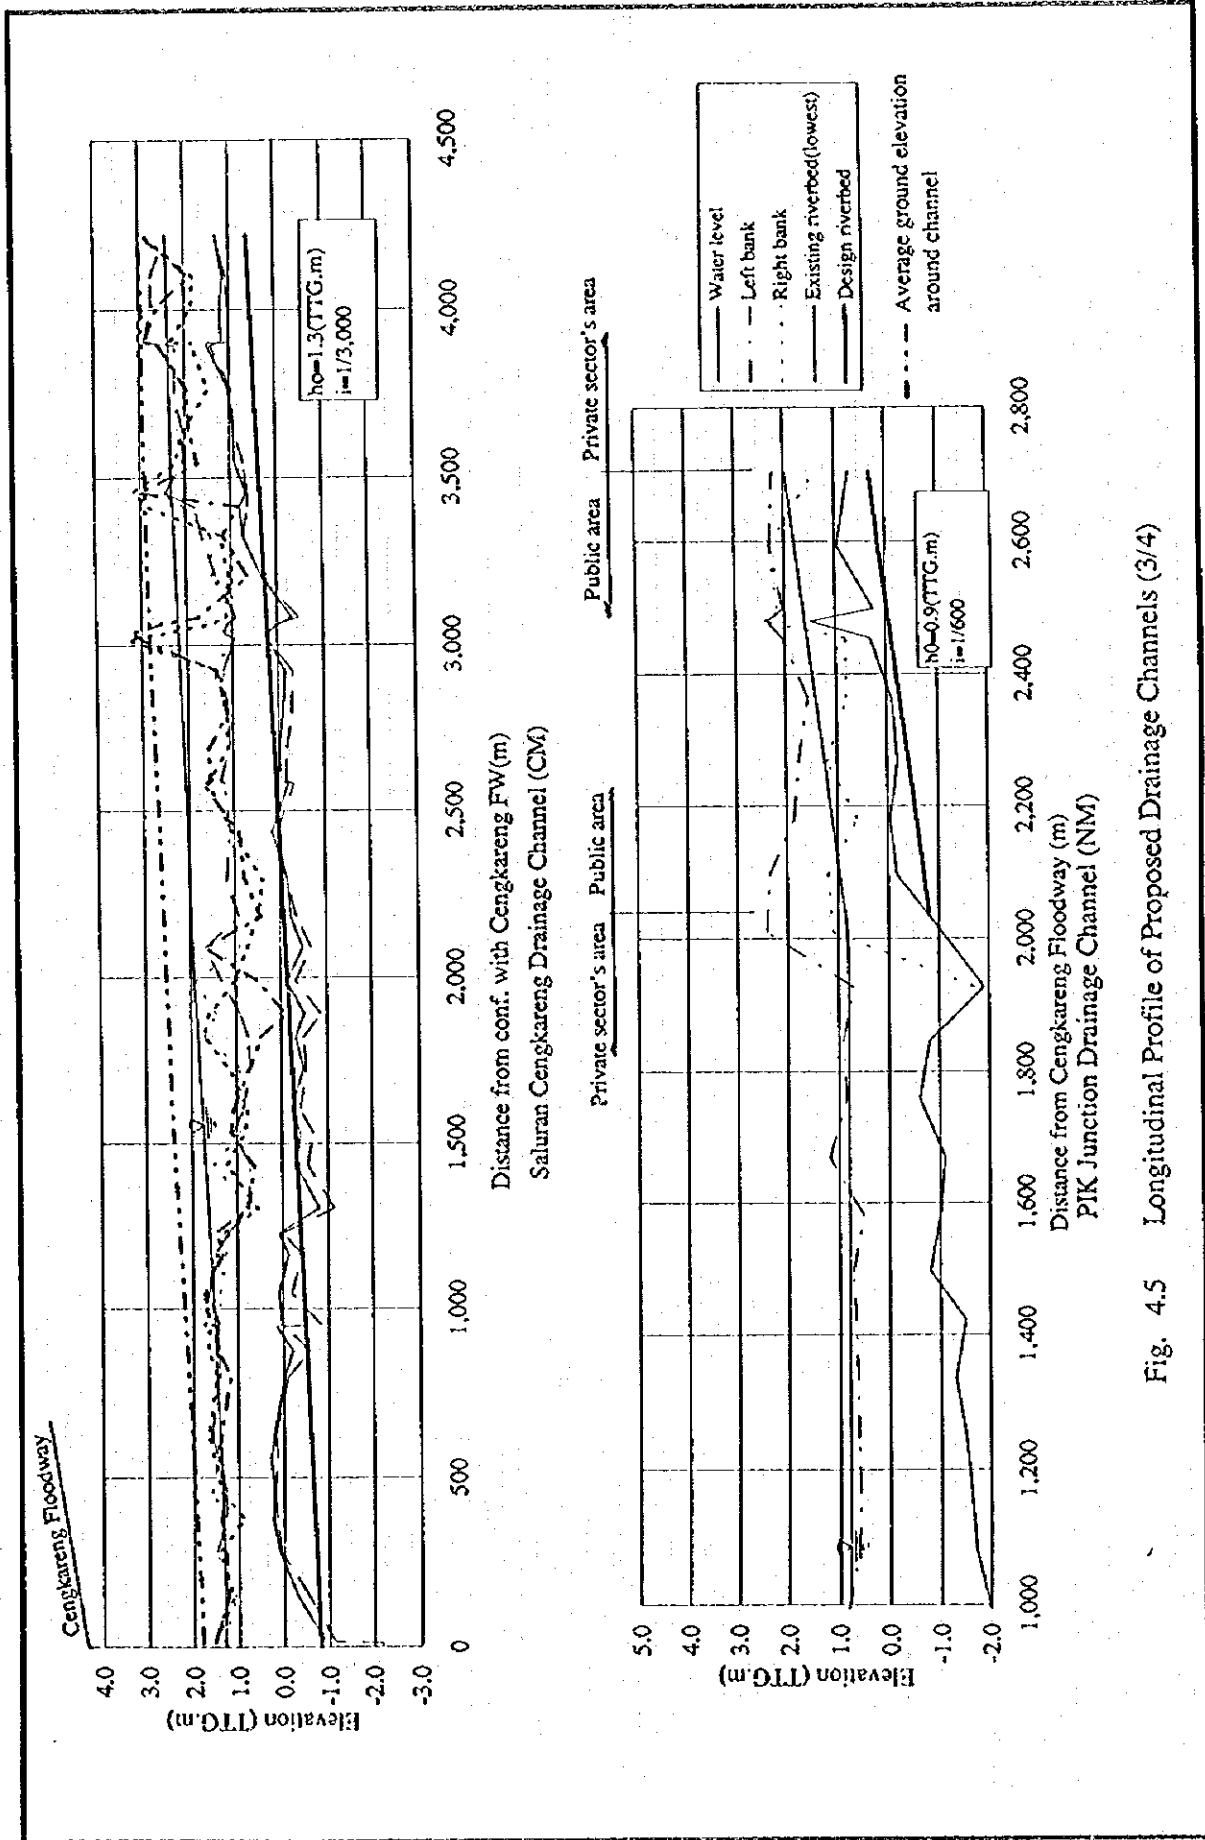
Longitudinal Profile of Proposed Drainage Channels (3/4)
